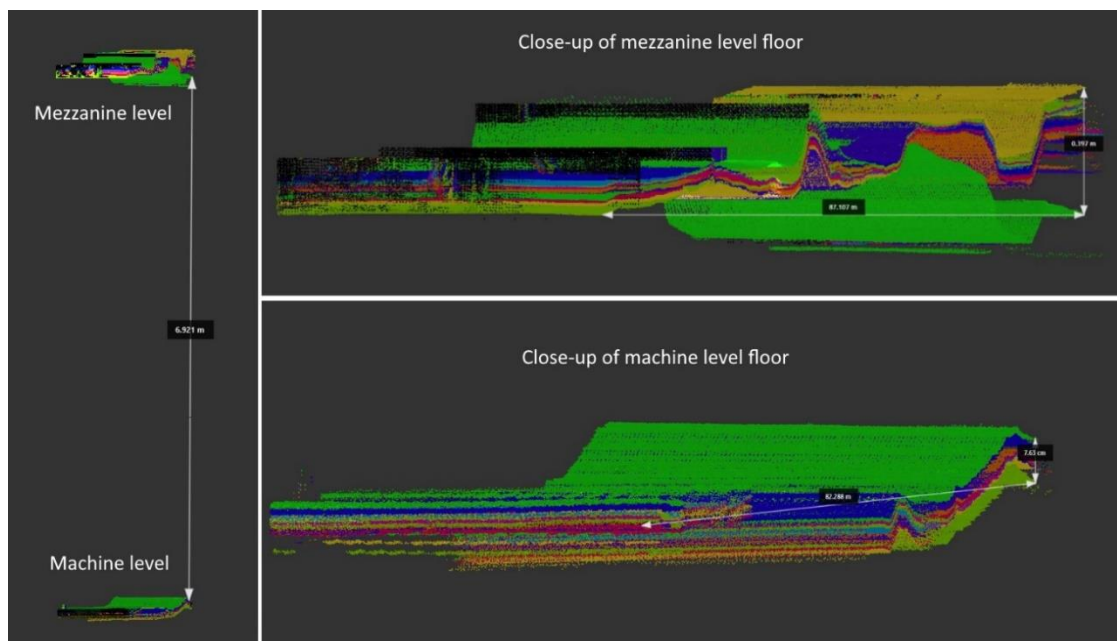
Longitudinal cross-section of machine hall, High dataset.
